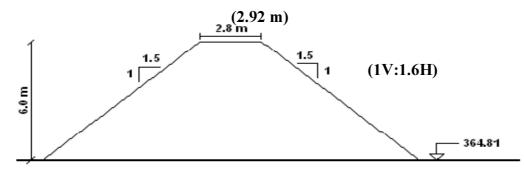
Standard cross-section of the 1-01 rockfill dam with initially given dimensions. The crest width, slope inclination and height were later on revised according to numbers in brackets.
